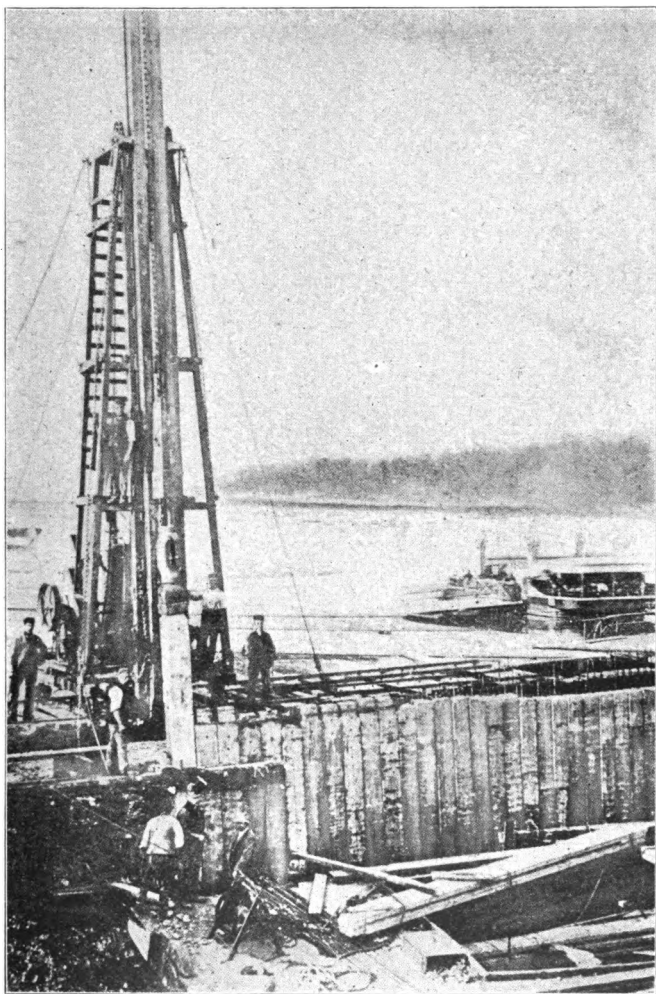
Driving of Reinforced Concrete Piles, using a 4,000 pound hammer. Section of piles, 8 by 16 inches; length; 40 feet.
